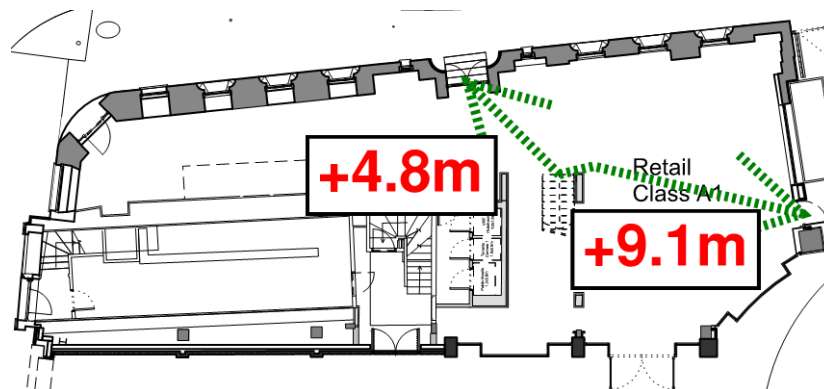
Two direction travel distances from the ground floor retail space of North building A
